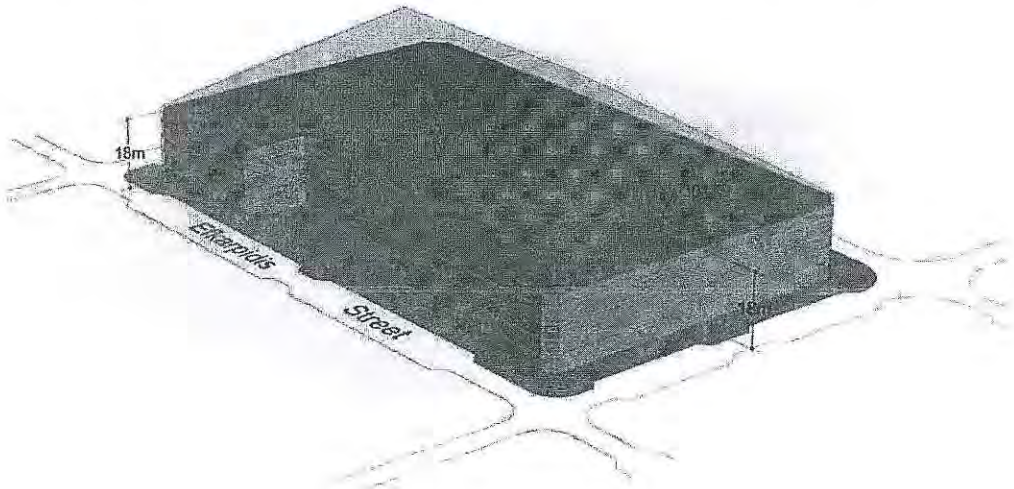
Building envelope in Precinct 1a (south of Hibberson Street)
